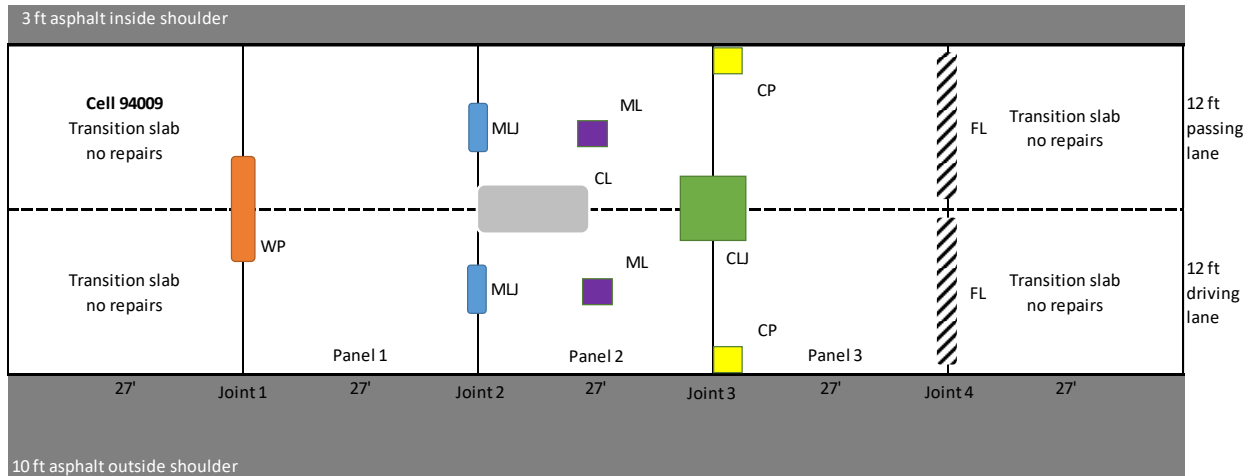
Patch layout for Cell 94009 – Crafcro, HP Concrete Cold Patch.
